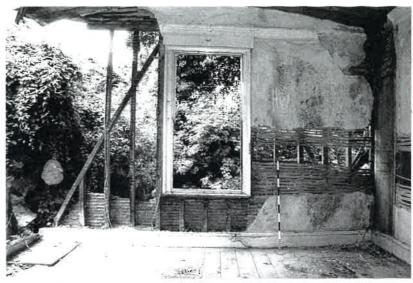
West wall of room H, showing construction of external walls and profiled wall plate
